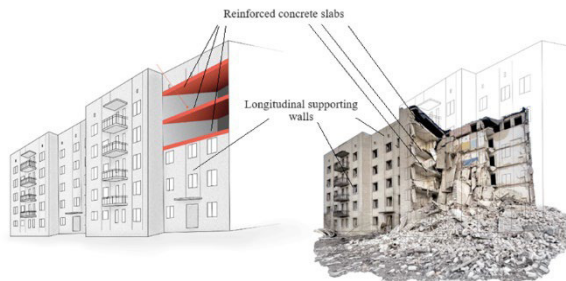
Nature of damage and scheme of destruction of a brick building in the town of Chasiv-Yar
